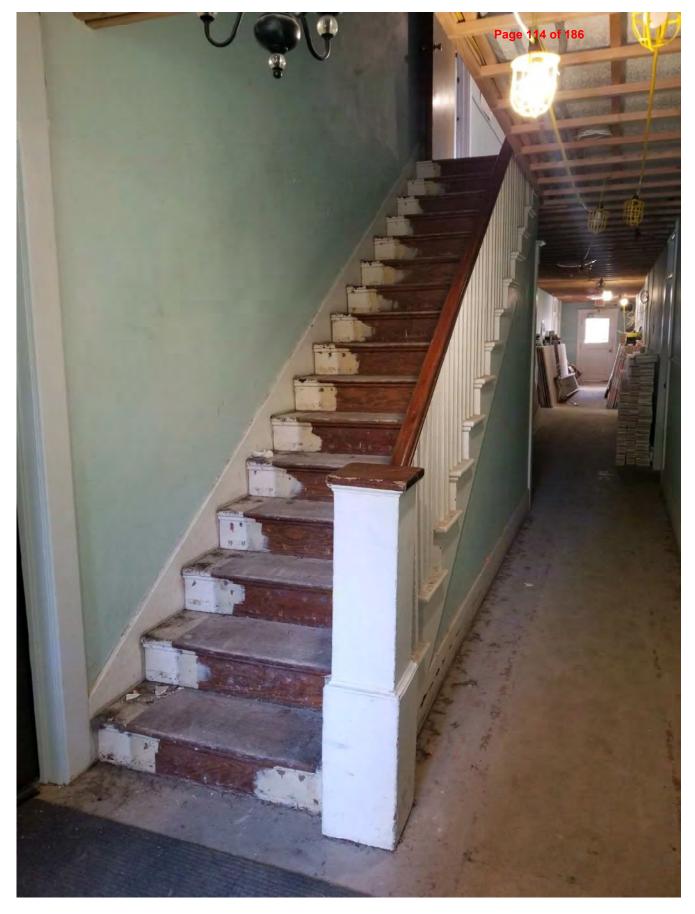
Newton Apartments, entry foyer and stair from First Floor to Second Floor, looking east.
